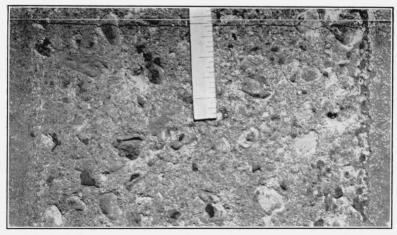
Concrete treated with three coats of liquid hardener after the concrete had set.
